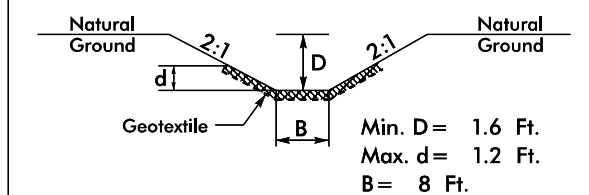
STANDARD BASE DITCH (Not to Scale)
